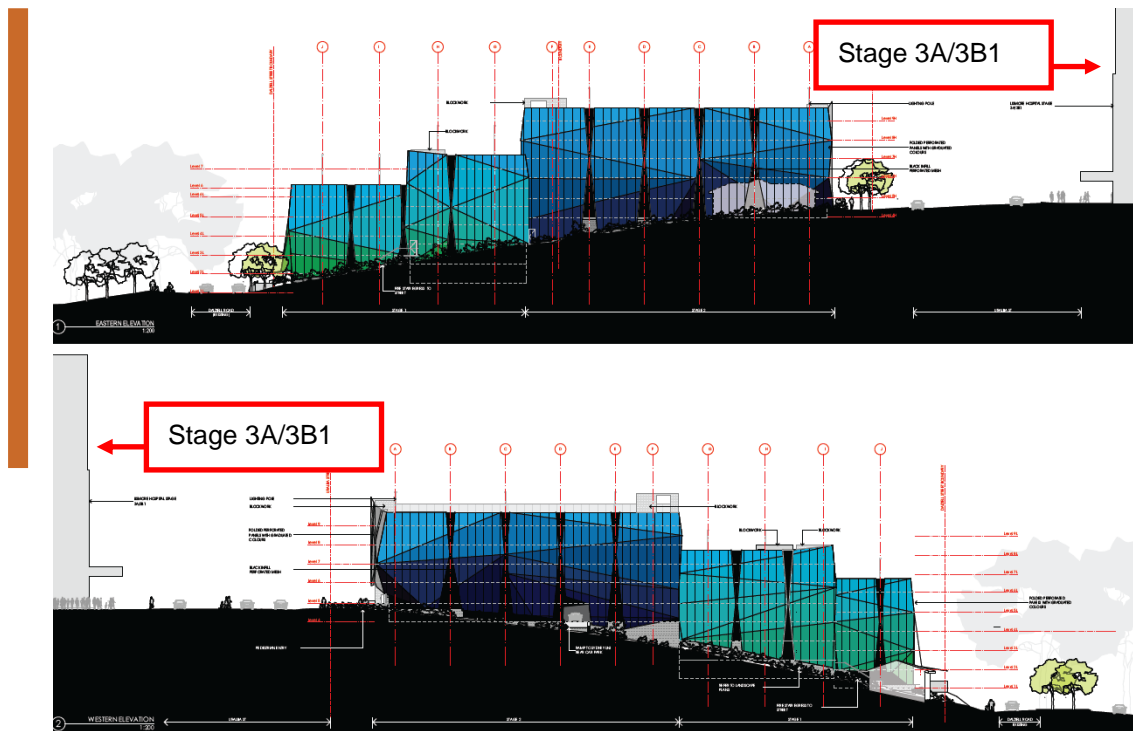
Eastern and Western Elevation Extracts (Source: Fitzpatrick)
